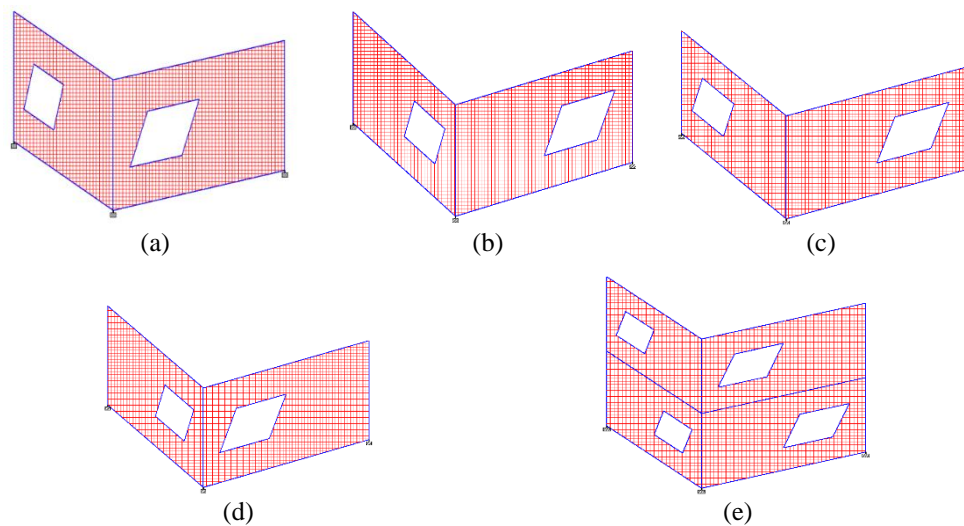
(a) Model-1; (b) Model-2; (c) Model-3; (d) Model-4, and; (e) Model-5 in shear wall of tall building
